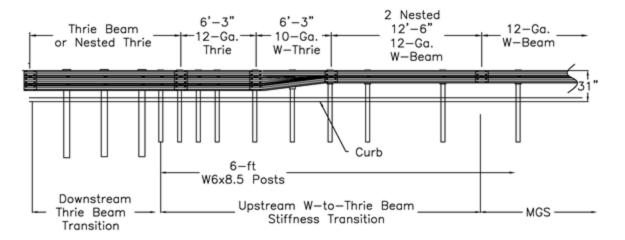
Nested W-beam Upstream from W-to-Thrie Segment for Curbed Installations
